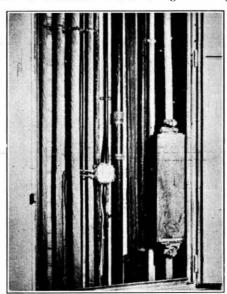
RISER SHAFT SHOWING E.L. & P. CABLES.
